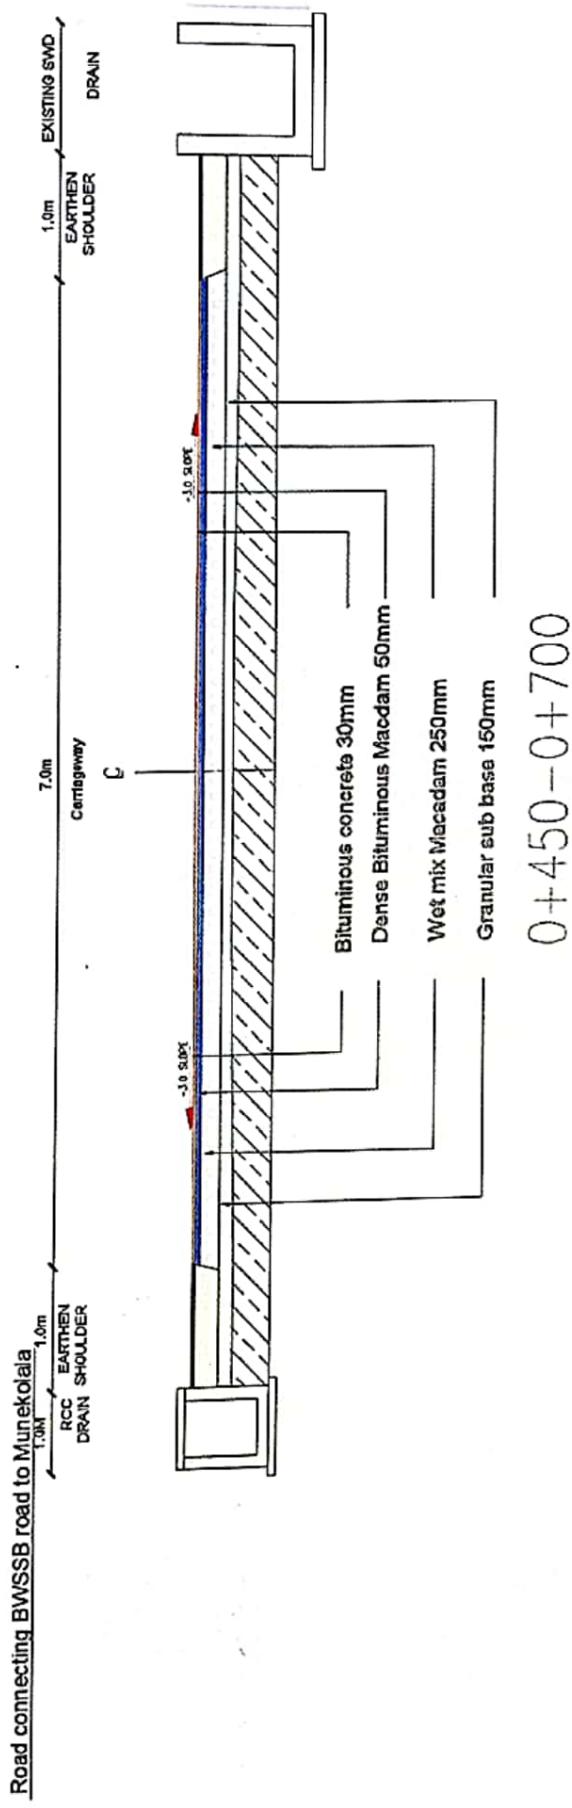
Proposed typical cross of Road Connecting BWSSB to Munekolala
